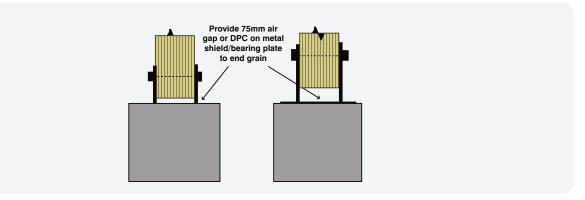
Air gap between the timber element to the masonry or concrete (Image Credit: WoodSolutions)
